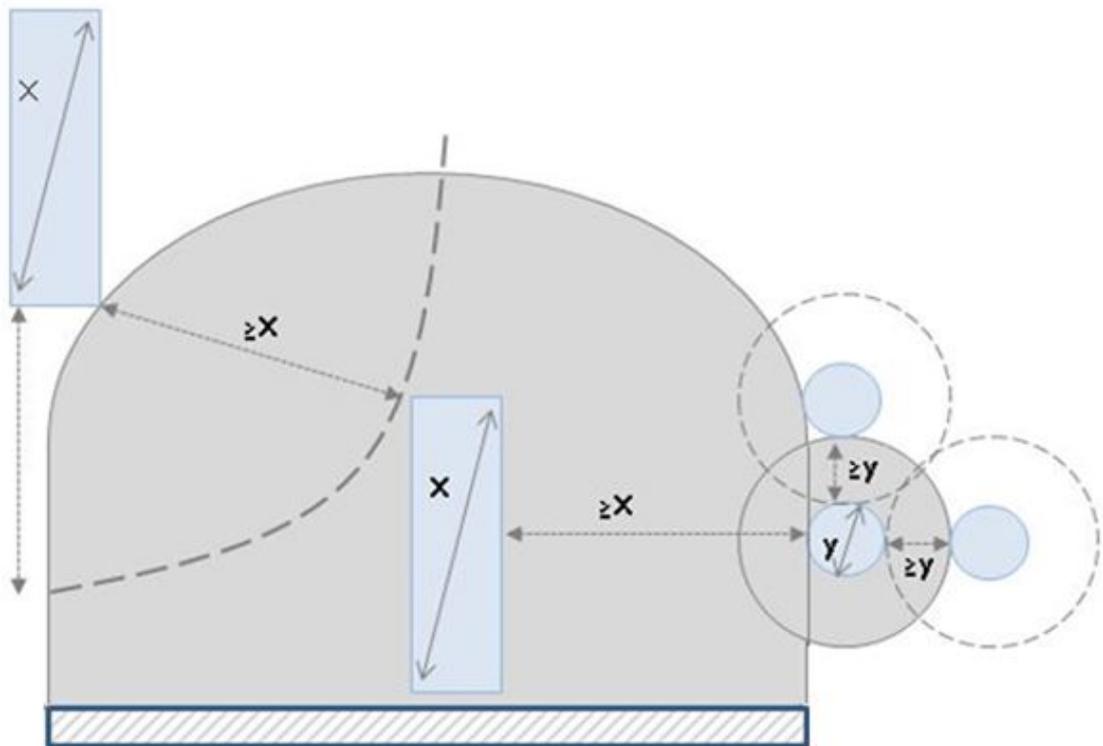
Layout restrictions on small TP(b)rooflights and light fittings with diffusers
